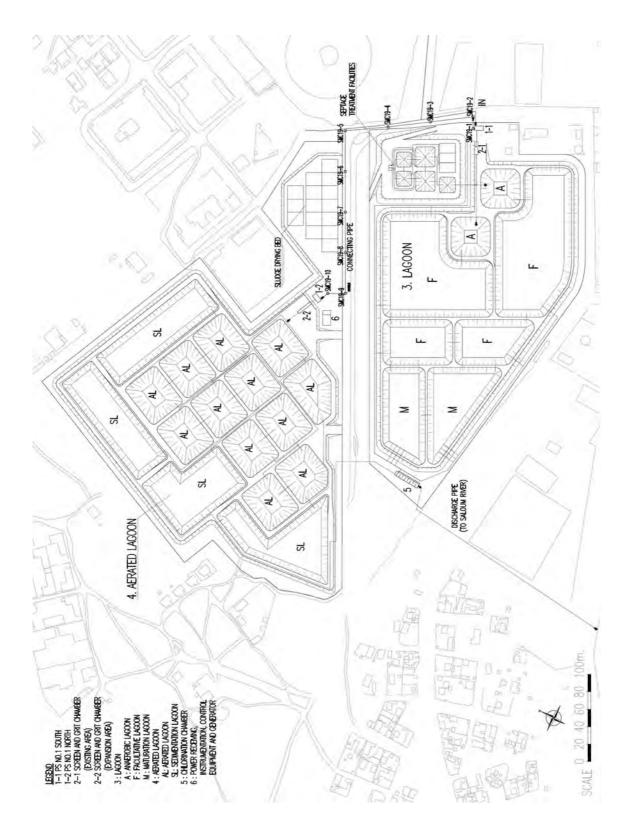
Typical Layout Plan and Section of Aerated Lagoon
